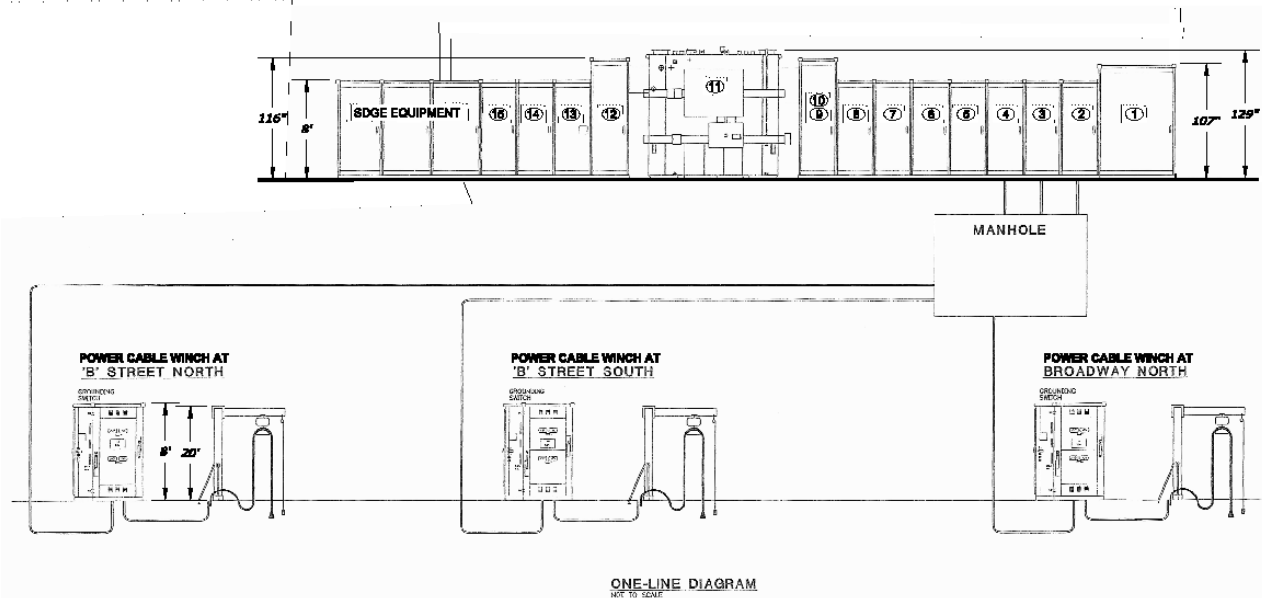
provides a general overview of the location of each piece of equipment to be installed on B Street and Broadway piers. Figures 6 and 7 show detailed schematics of the proposed equipment.
